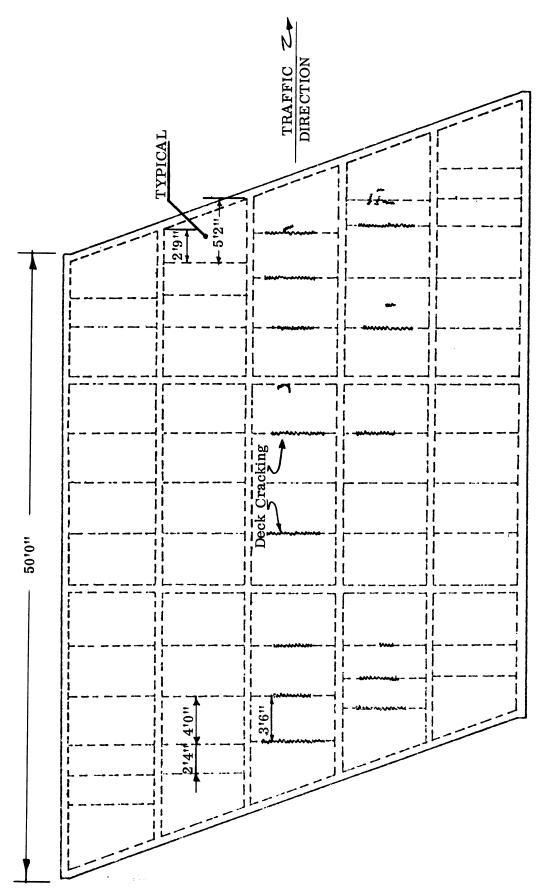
Typical panel layout and cracking on deck surface above subdeck joints. (From Reference 1.)
